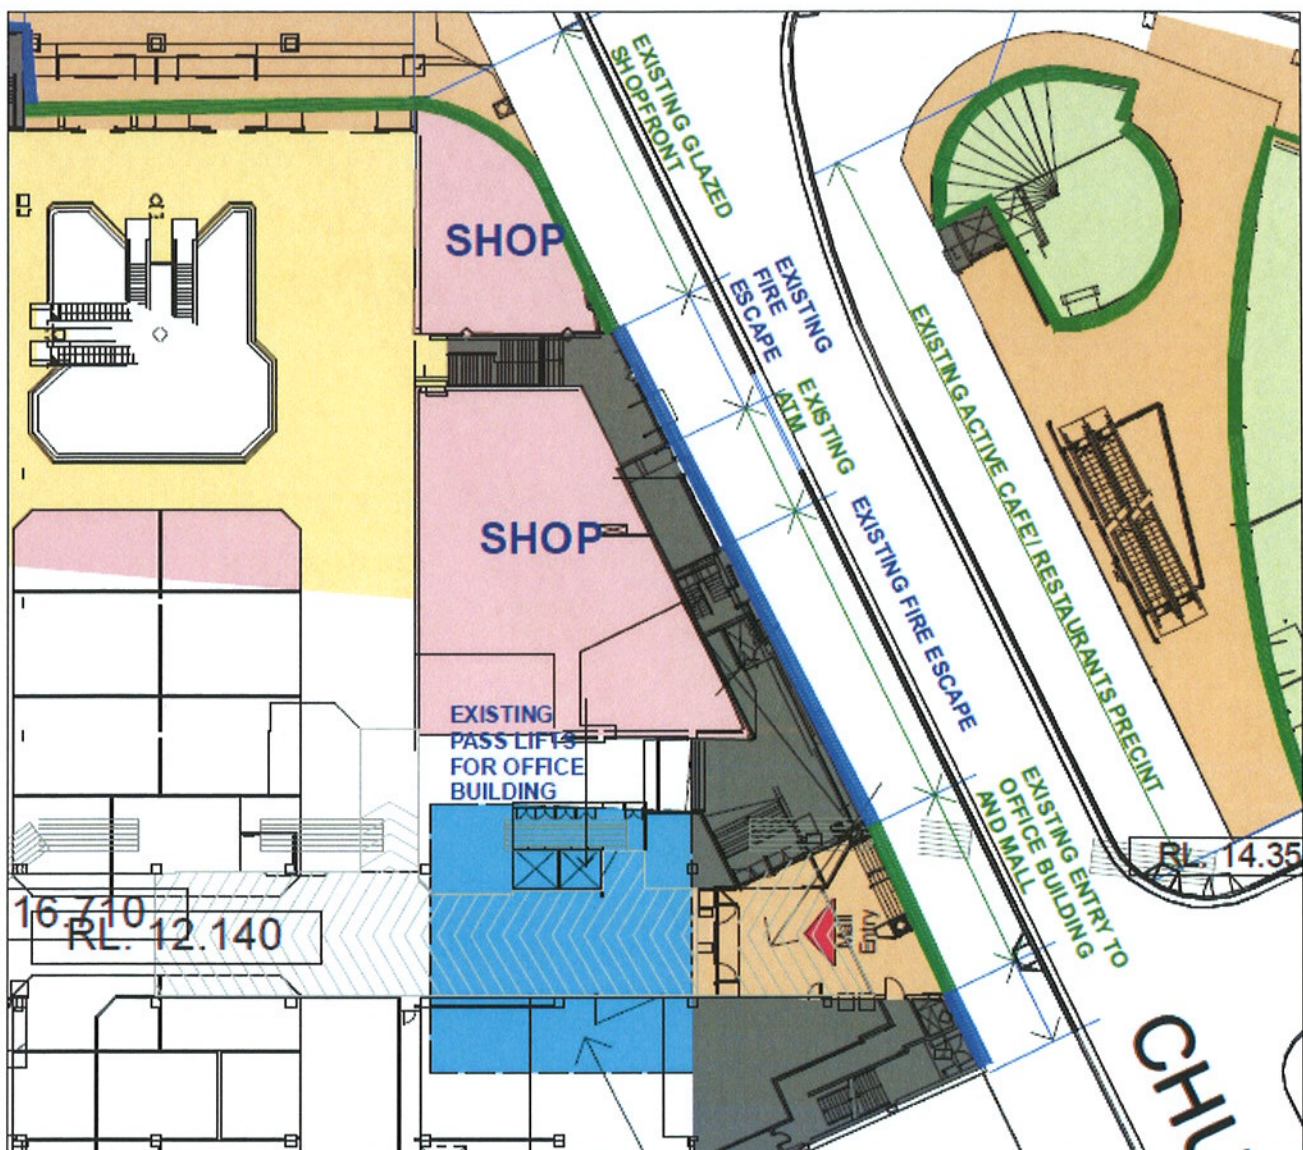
Existing inactive façades to Church Street retained (source: "Street Activation Concept Floor Plan" in Proponent's PPR)
